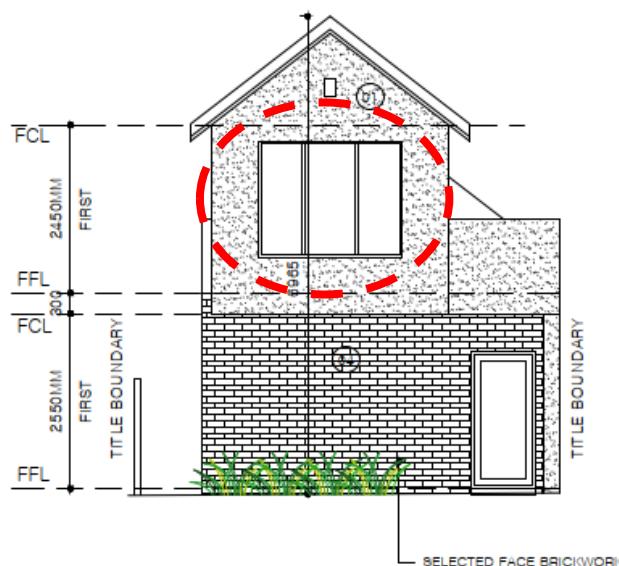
West elevation with first floor window highlighted with dashed red circle. Source: Advertised plans.
